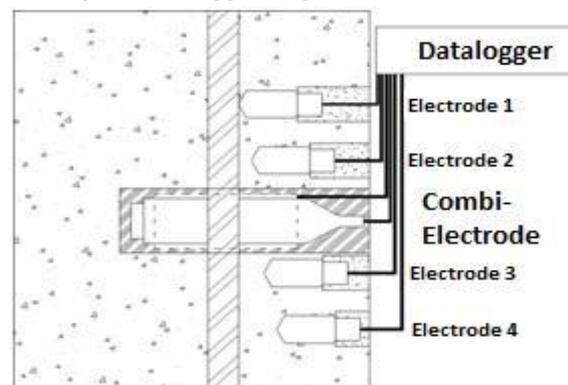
Sectional view of the mounted CorroRisk probe
